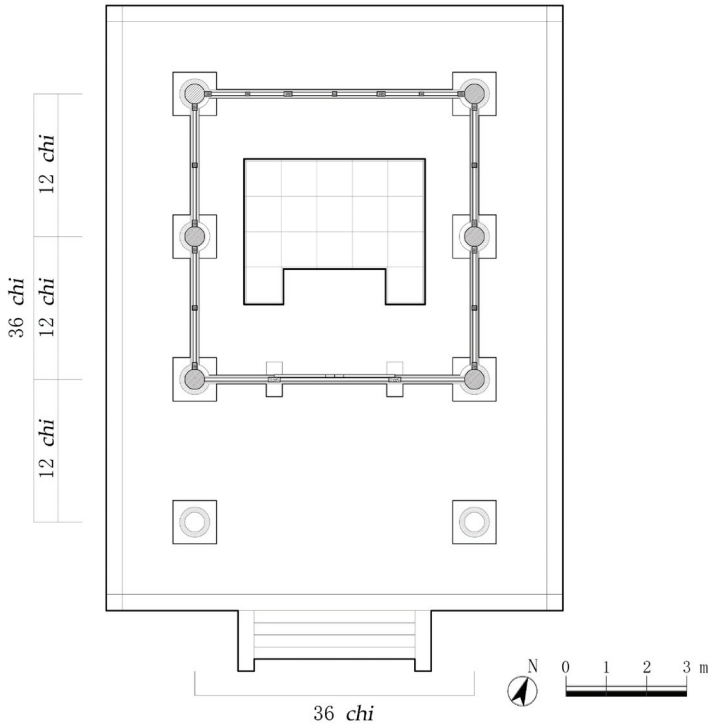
Master plan of the main hall reconstruction. Drawing by authors.
